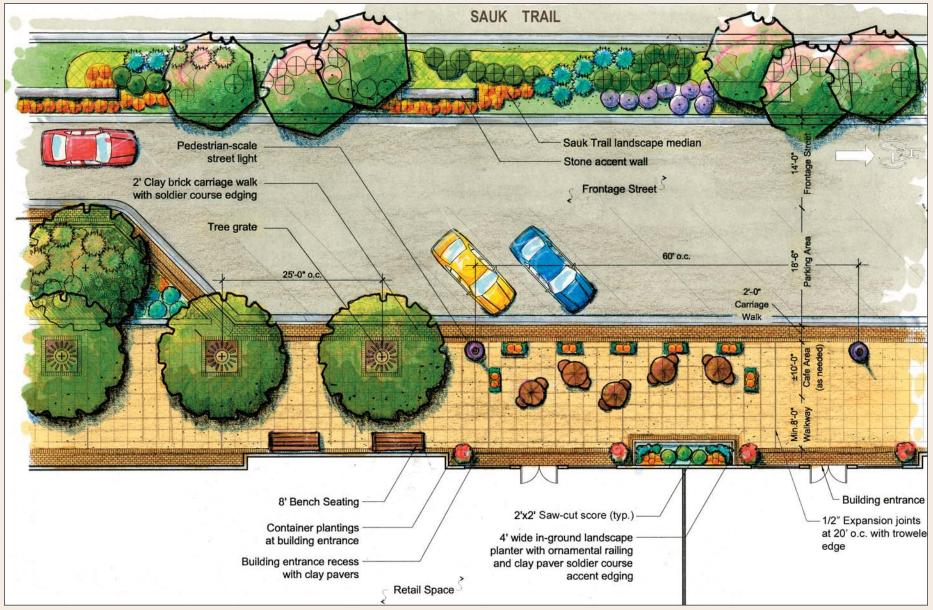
Core Area Detail Plan illustrates streetsape materials and their locations.
